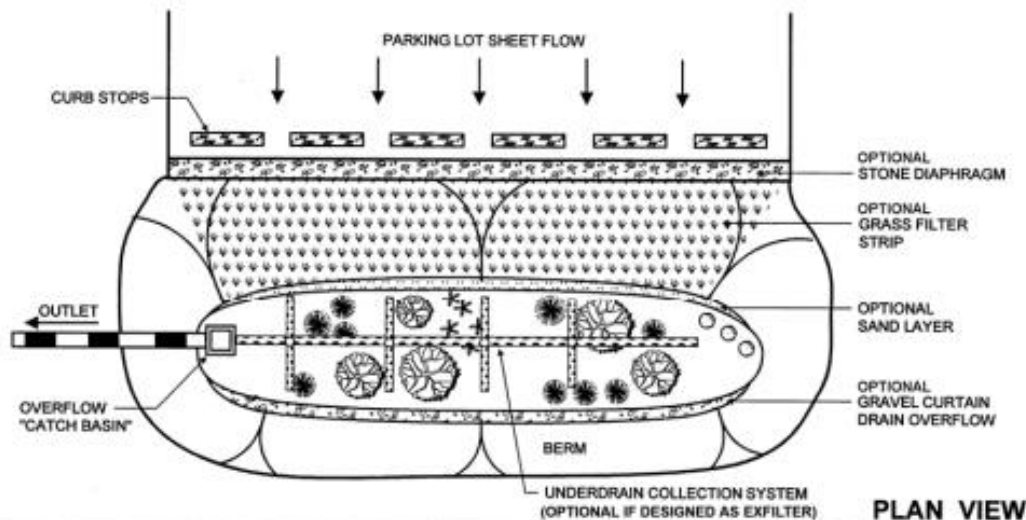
Typical detail of a bioretention area. (Image source: RI Stormwater Manual, 2010)
